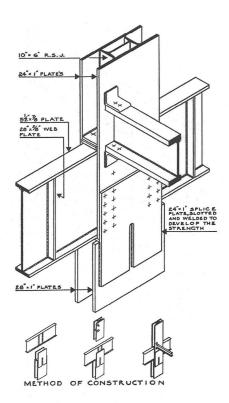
Simpson's Store, Piccadilly, London. Details of the welded frame. From *Architects Journal
